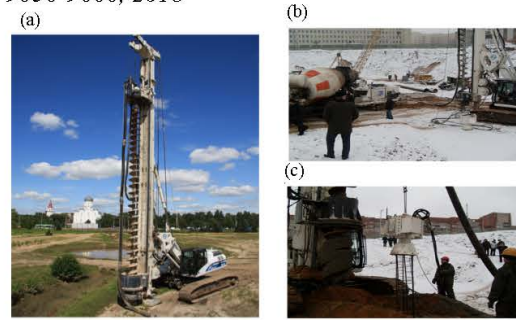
Equipment for piling CFA: a) Drilling rig with a solid hollow auger; b) Drilling rig for excavating of wells and c) Lifting of the auger and installation with the vibrohammer after that installation the reinforcement cage
